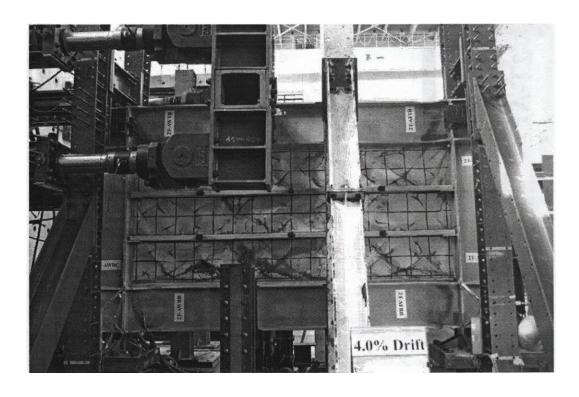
Specimen 2T Test at 4% Drift (Lin and Tsai 2004)
